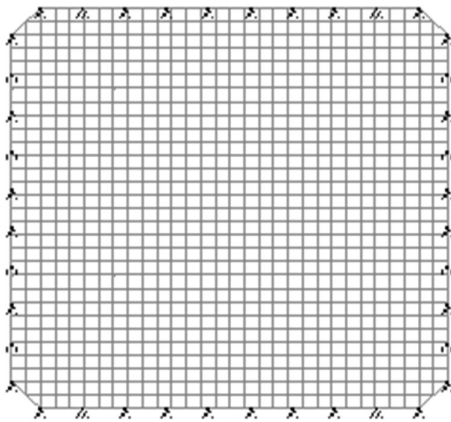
Bottom Grid Plan with Mesh Size 2m x 2m, with Column Placement.
